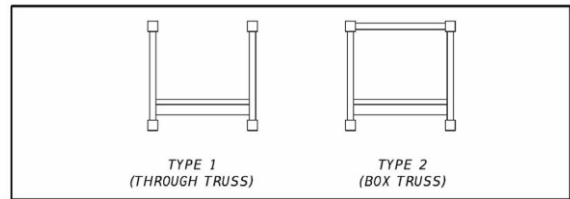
Prefabricated Pedestrian Bridge Standard Truss Member Shapes
